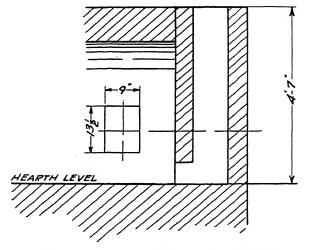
Arrangement of Flue in Furnace Sidewall.
